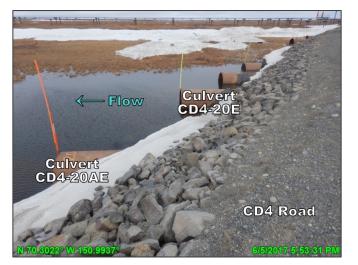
East side of CD4 road south of CD5 road, looking southeast; June 5, 2017
